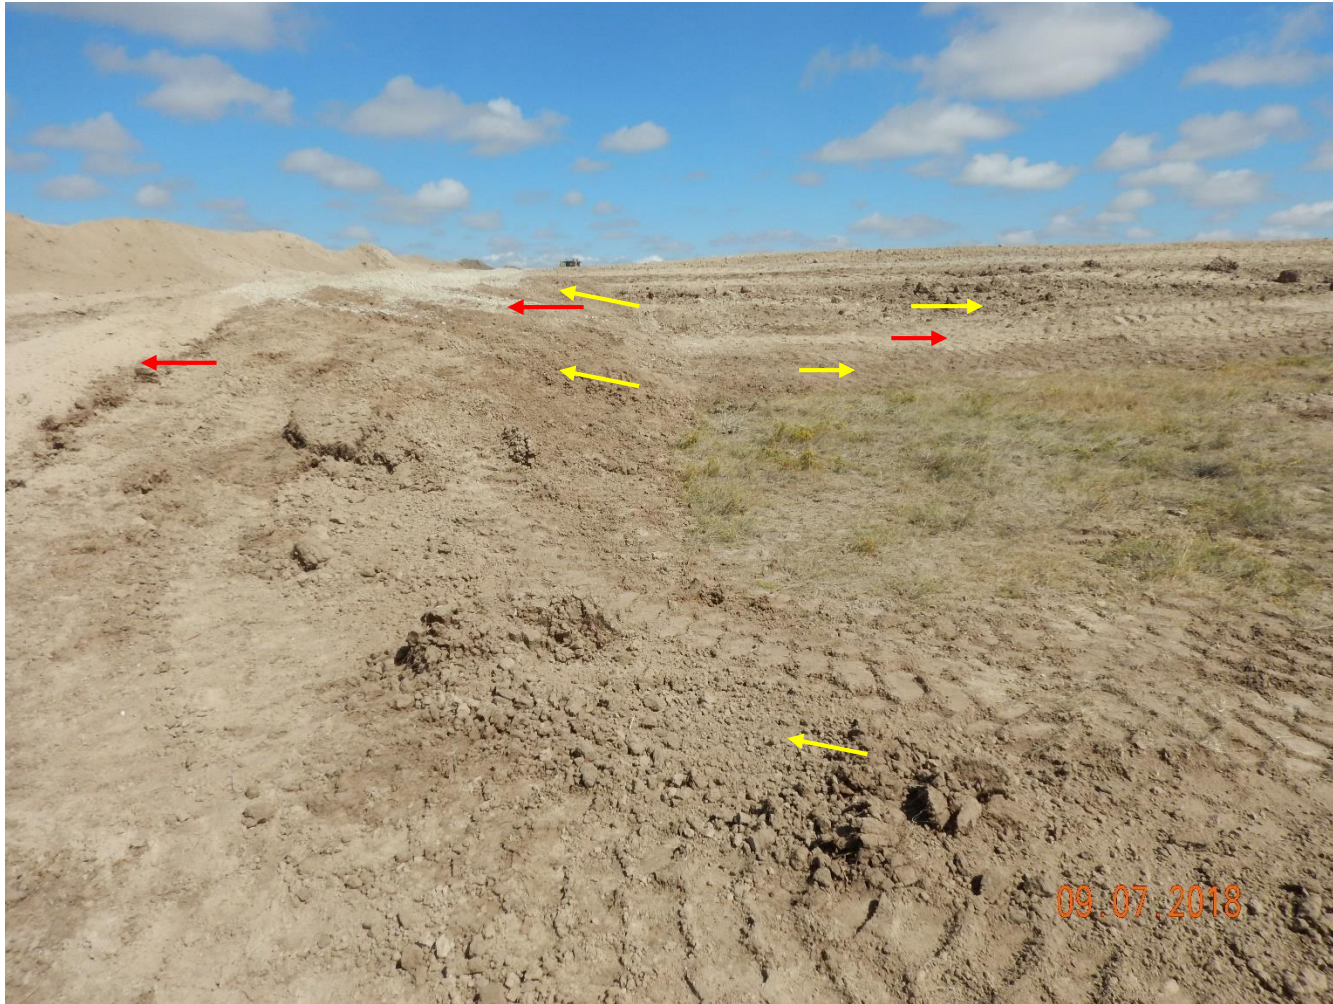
Photo taken from the southwest end of the pad. Photo shows construction in process. It does not appear as though soil salvage has been conducted on this section of the location. Additionally, It is unclear how the horizons are being separated as topsoil (dark soils, yellow arrow) appears to be mixing with subsoils (Light, red arrow). TOPSOIL APPEARS TO BE BEING USED AND INCORPORATED AS FILL MATERIAL.
